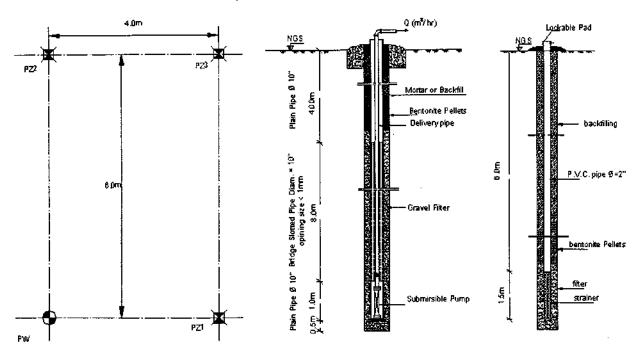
Site (A): Test Arrangement, Well and Piezometer Configurations
